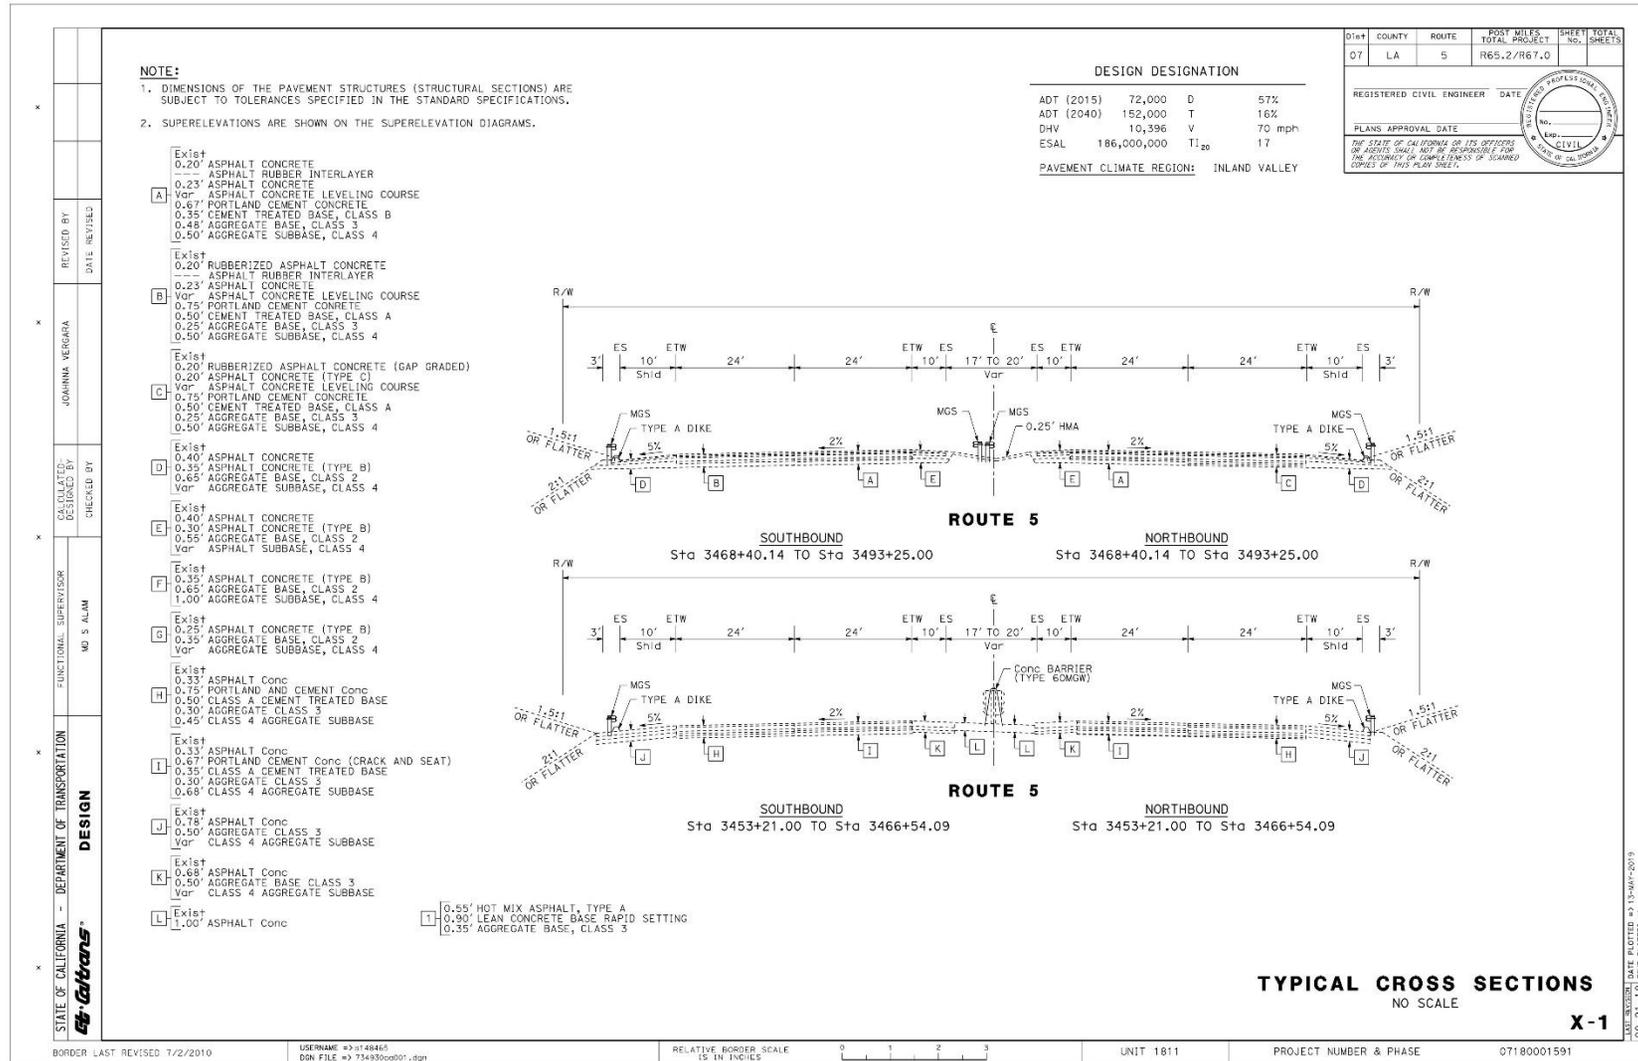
Typical Cross Sections X-1 Templin Highway UC
